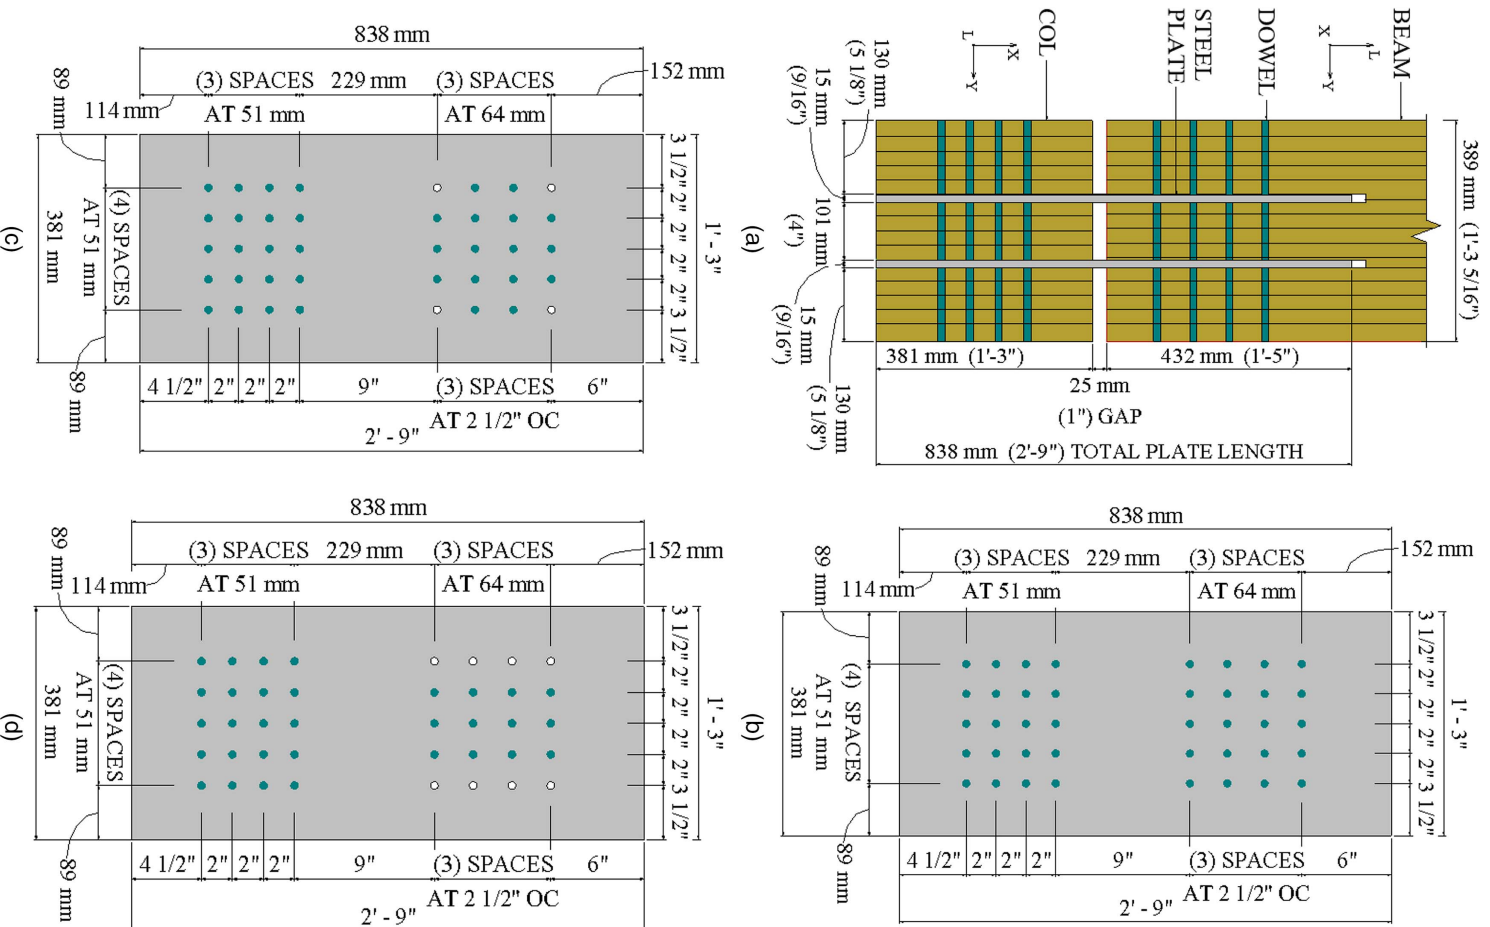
Joint details: (a) section A-A; (b) joints J20M and J20C; (c) joints J16M and J16C; and (d) joints J12M and J12C.
